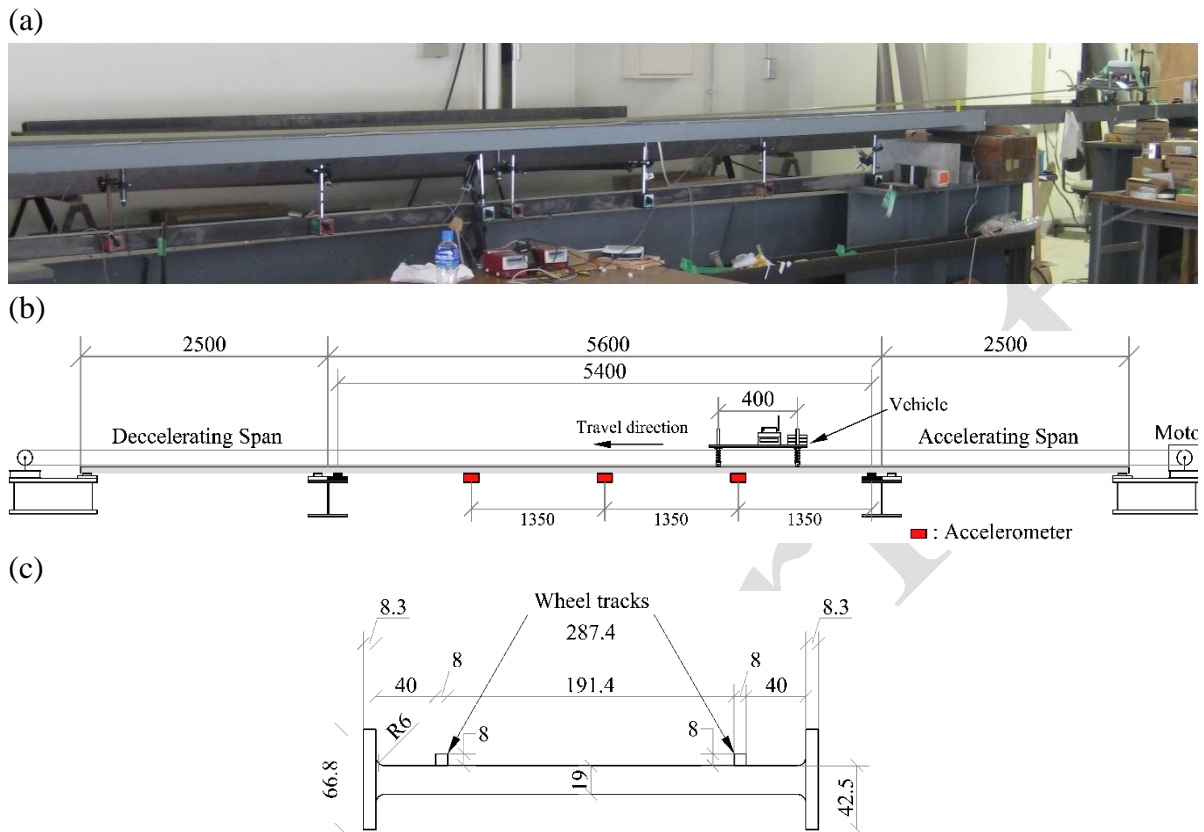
Experimental bridge and set-up; (a) Laboratory setup (b) Elevation of setup (c) Beam cross-section (units in mm).
